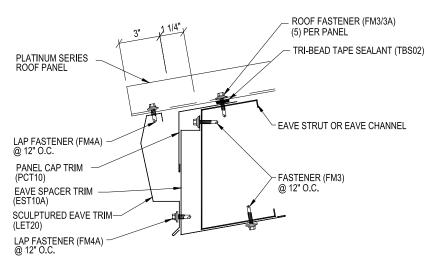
DETAILS W/ SIMPLE EAVE W/O SOFFIT
